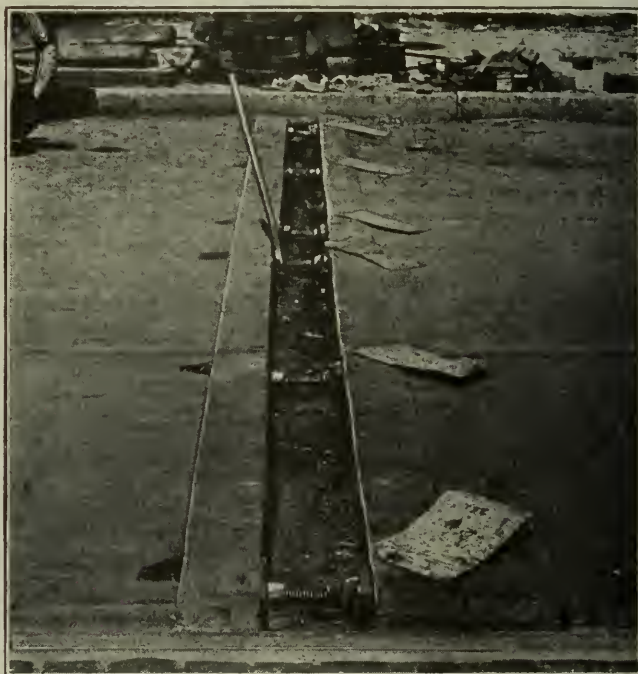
ARRANGEMENT OF JACKSCREWS FOR TIGHTENING WOOD BLOCK PAVEMENT
